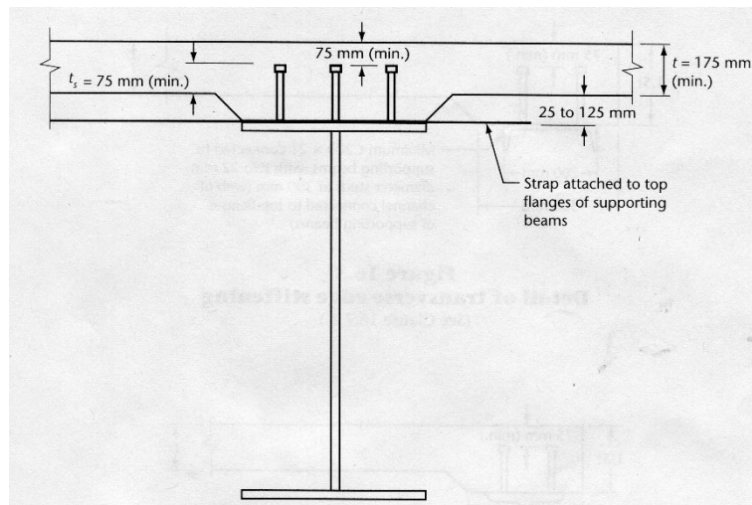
Partial cross-section of an externally restrained deck slab supported on steel girders (CHBDC, 2006).
